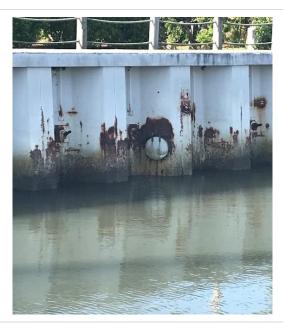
rust/corrosion (typical) around flapper valve, anchorage and bulkhead, Station 45+50
